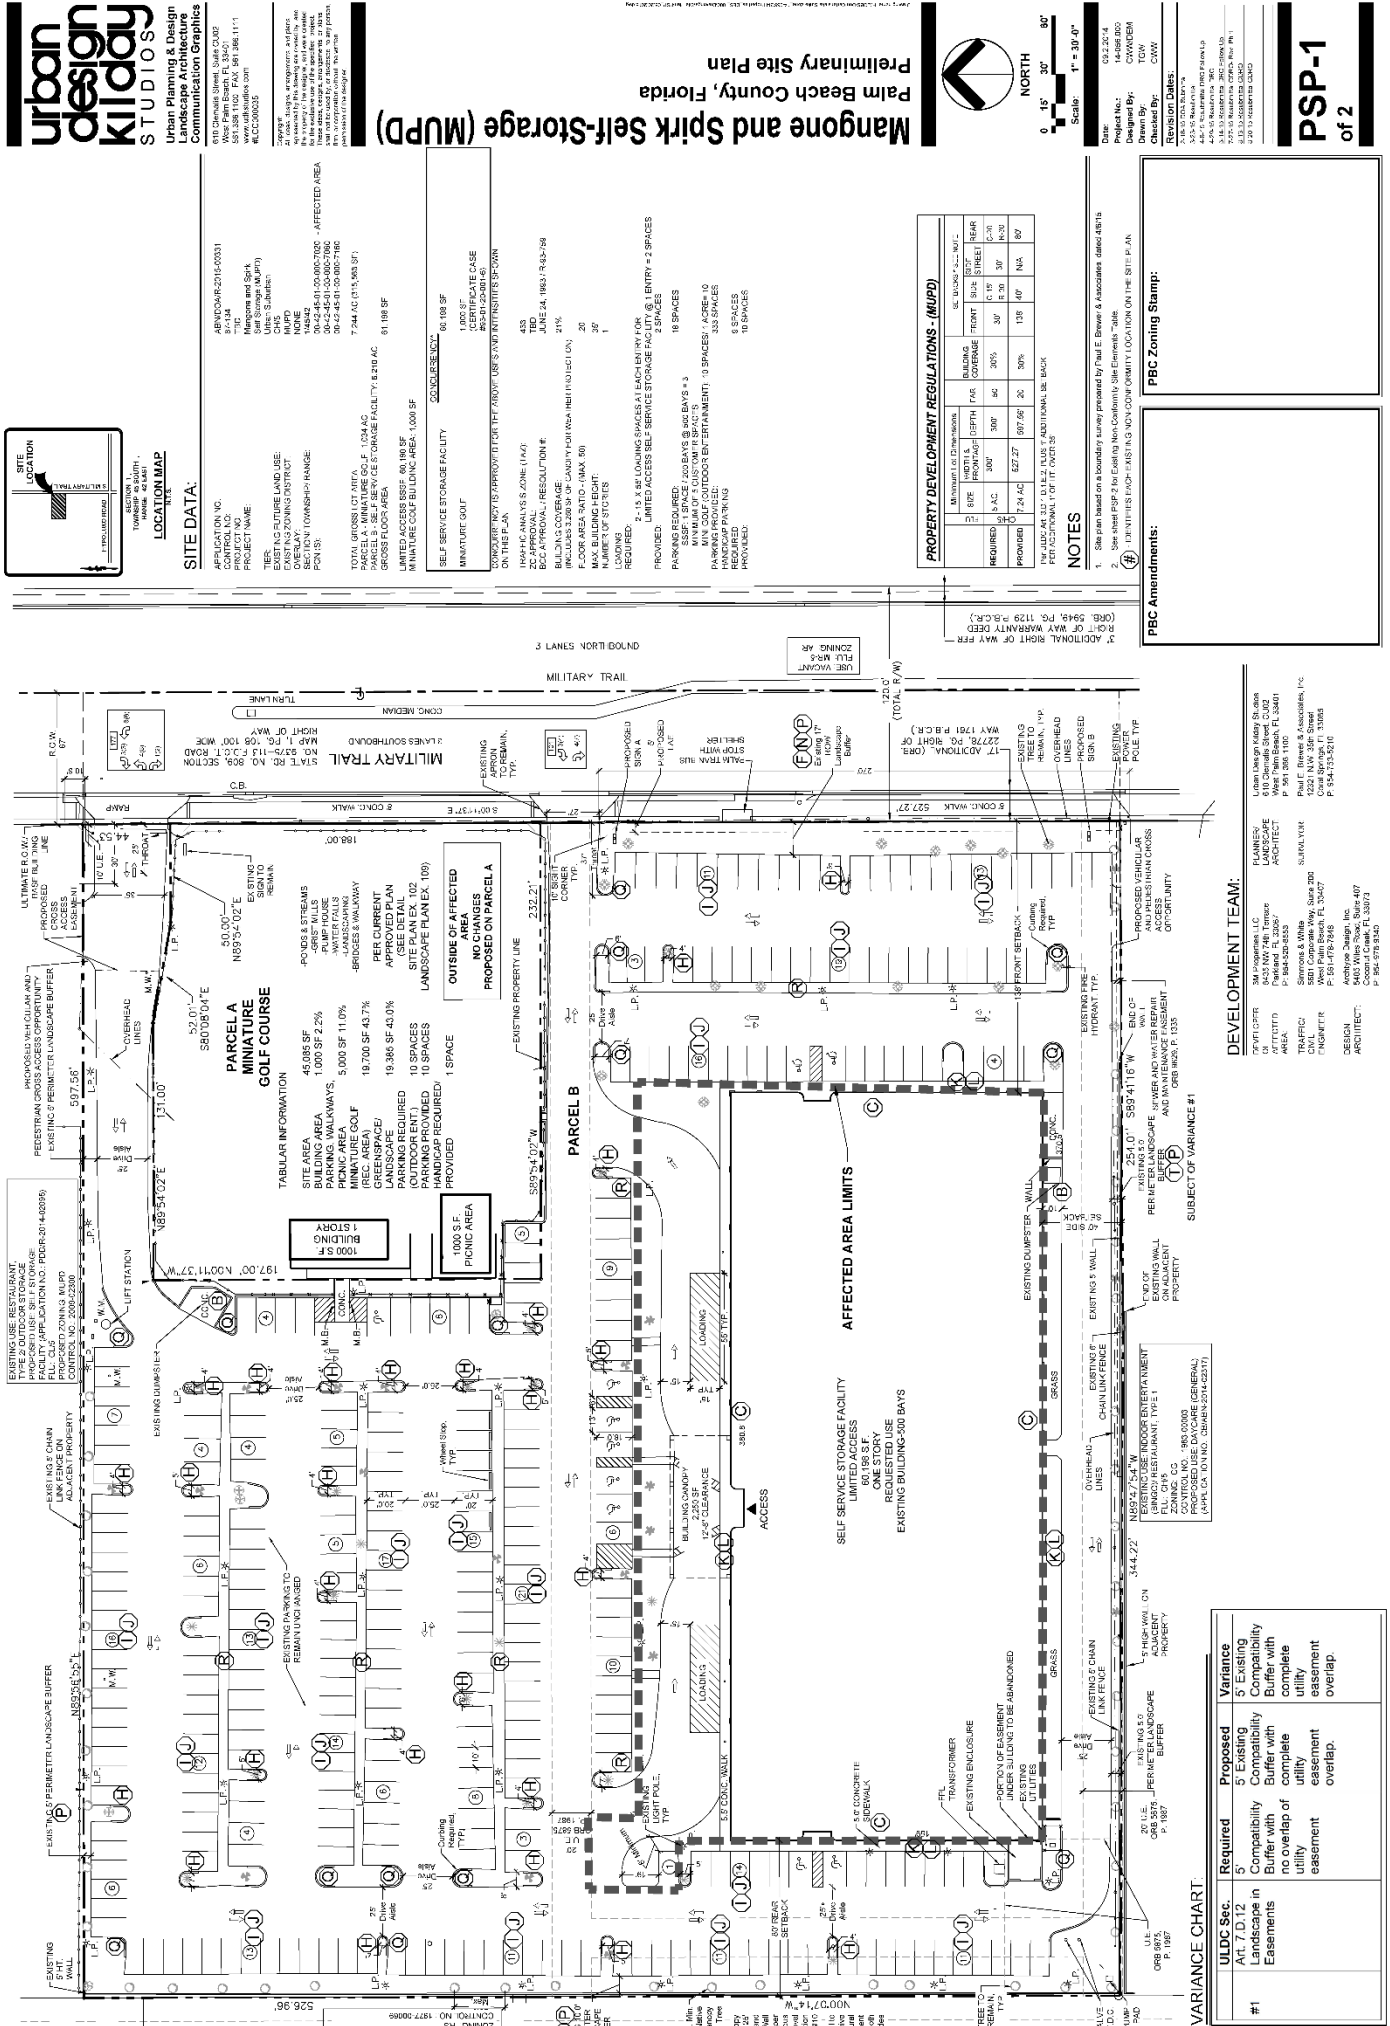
Previously Approved Preliminary Site Plan, Sheet 2 of 2 dated August 20, 2015
